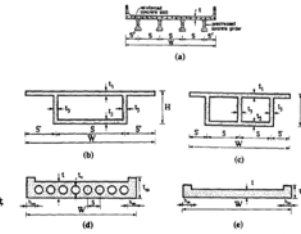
Transverse Bridge Configurations: (a) Reinforced Concrete Slab on Precast Concrete Girders; (b) Single-Cell Box Girder; (c) Two-Cell Box Girder; (d) Voided Slab; and (e) Solid Slab
